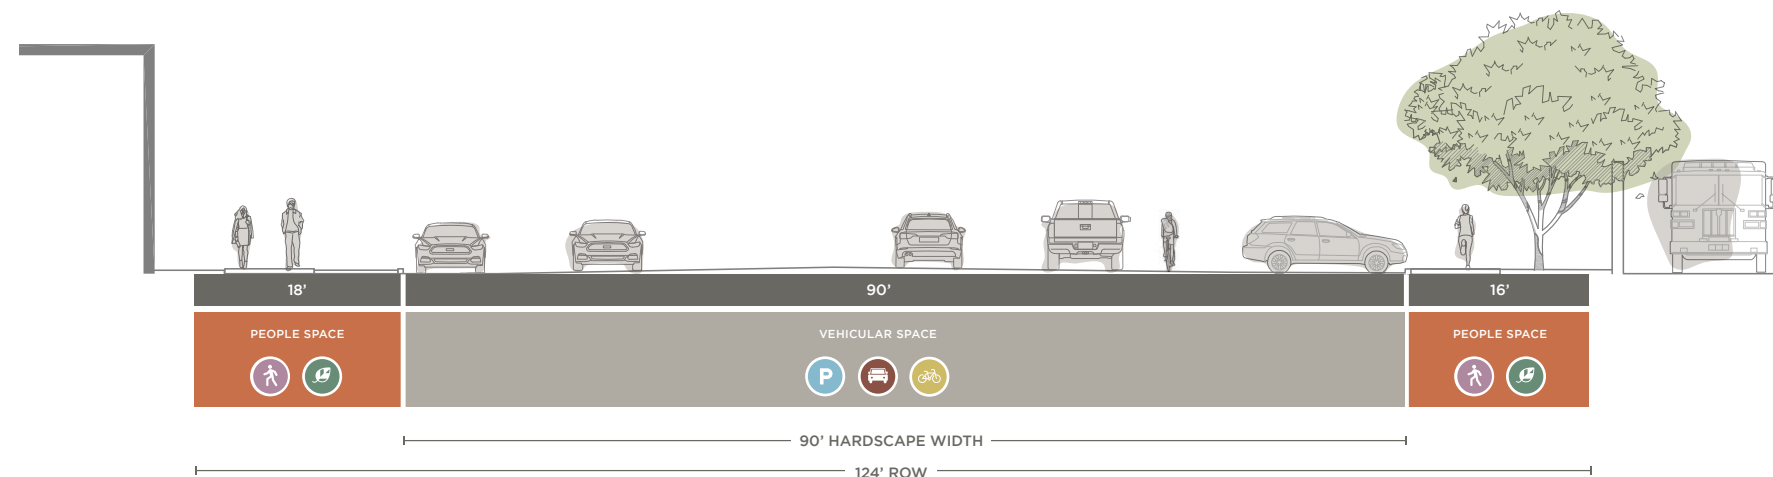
Existing 2020 Japantown Street and Roadway Section
